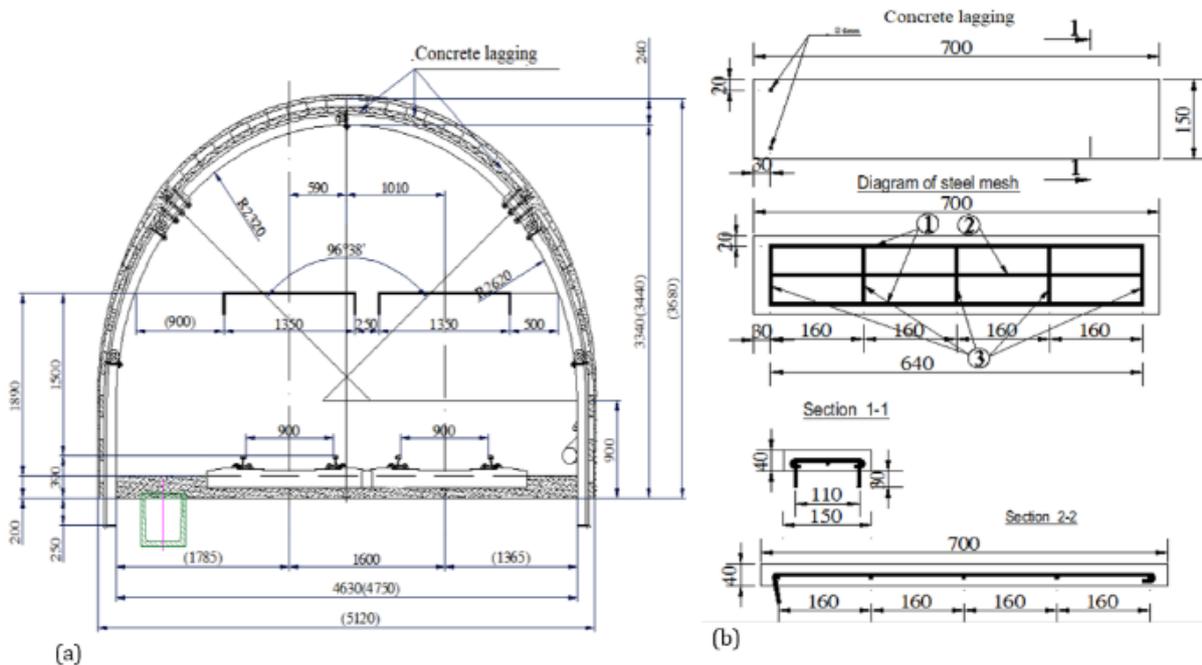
Structure of concrete lagging with length $L = 0.7$ m in Ha Lam coal mine, Quang Ninh. (a) The concrete lagging in SVP steel arches at a drift; (b) The structure of concrete lagging.
